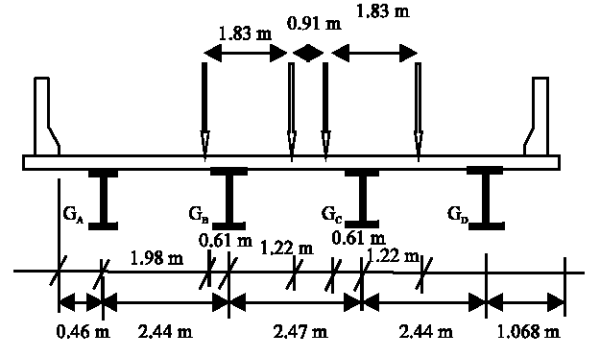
Typical transverse section of bridge showing HL-93 loading location (AASHTO, 2004)
